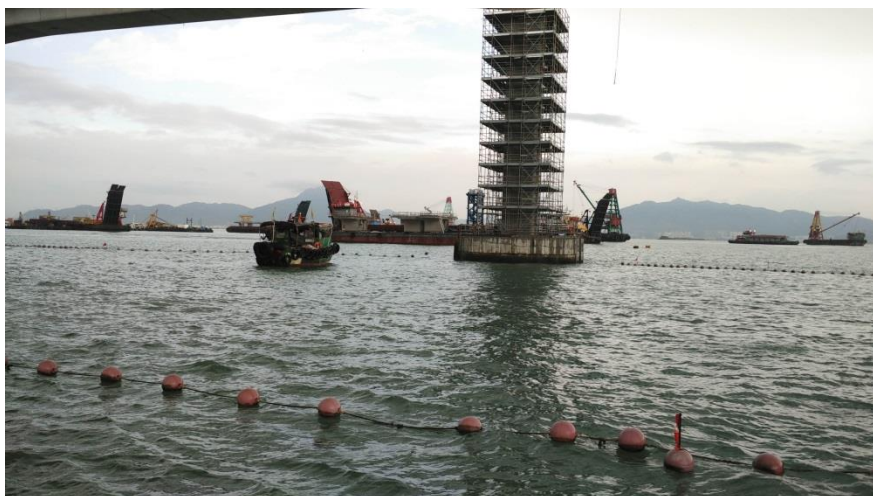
Mid-Flood at SR4 on 22 September 2017
